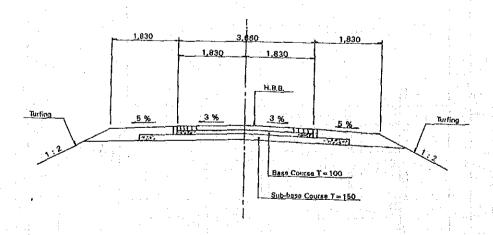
TYPICAL CROSS SECTION OF APPROACH ROADS
